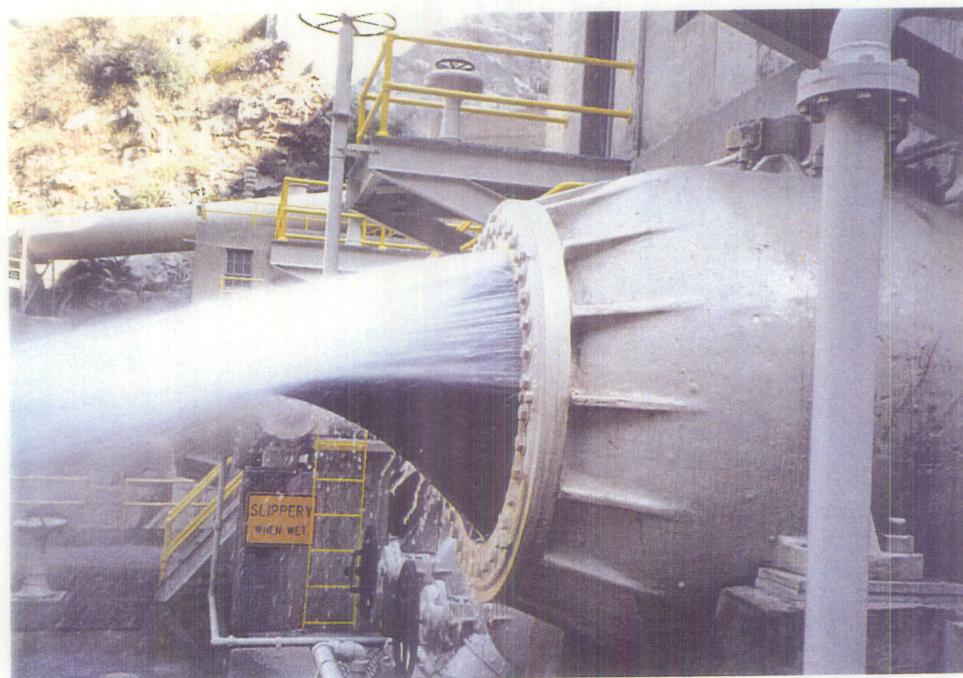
Morris Dam - Needle Valve 3 - View showing needle valve body and leakage at full head. 07/01/98
